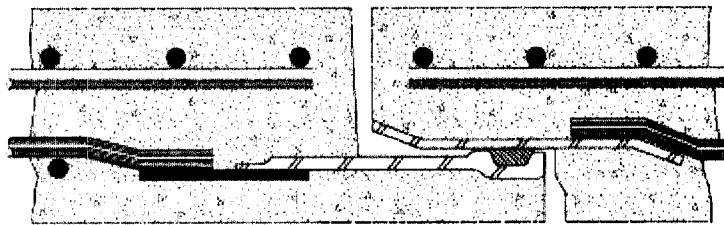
Typical cross section of steel end ring joint with spigot groove and O-ring gasket. (Figures 3-14 to 3-18 are adopted from American Concrete Pipe Association)
